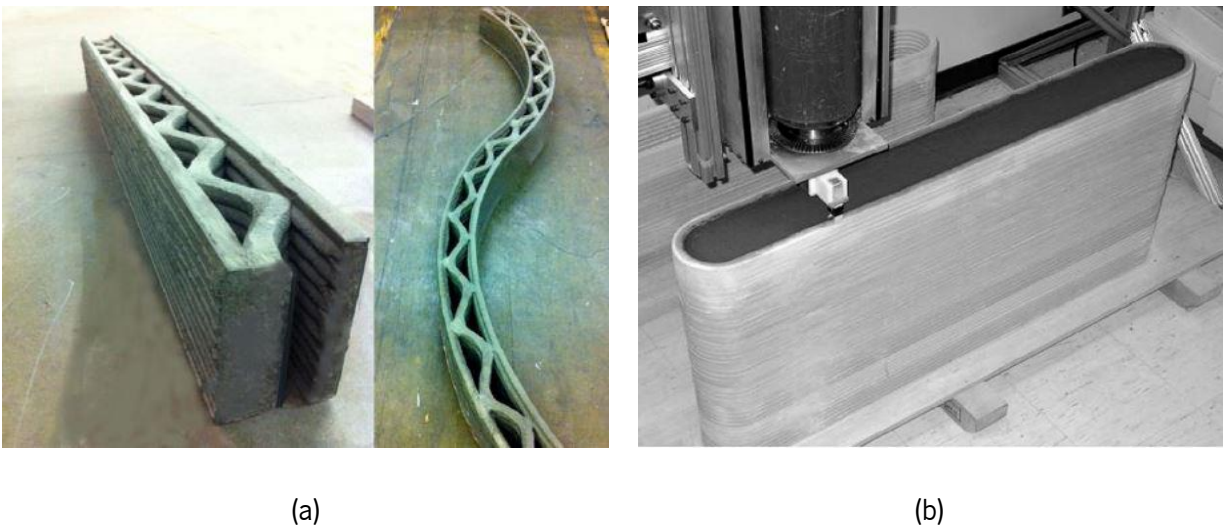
Objects created using CC technology. (a) Wall section and (b) Top view of a concrete wall (Behrokh Khoshnevis, Hwang, et al., 2006; X. Zhang et al., 2018).
